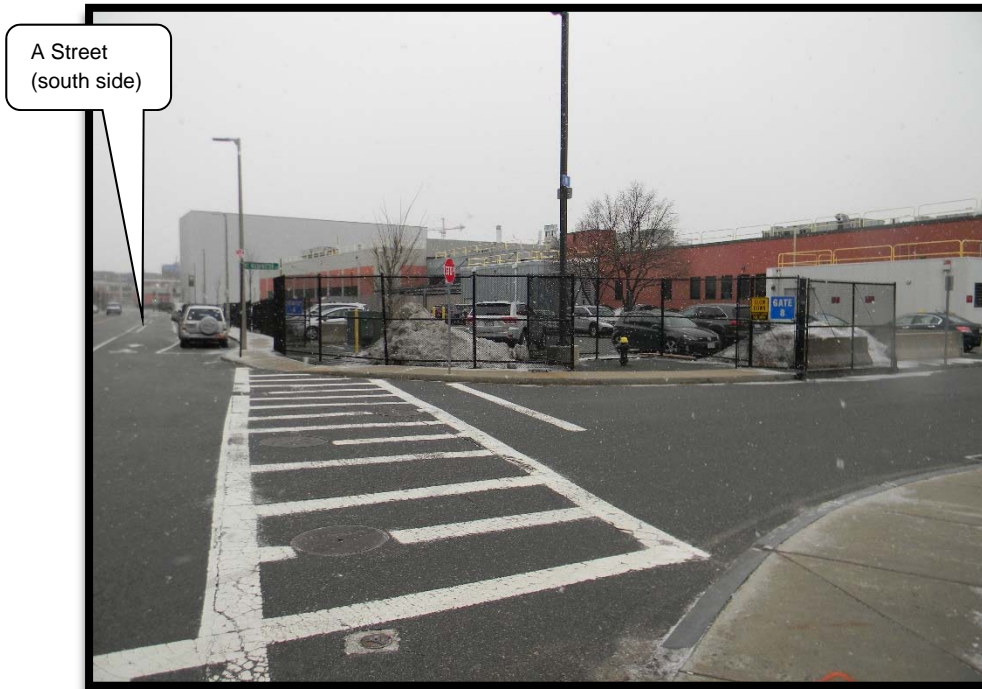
On corner of A Street and Driveway to Project looking southwest
